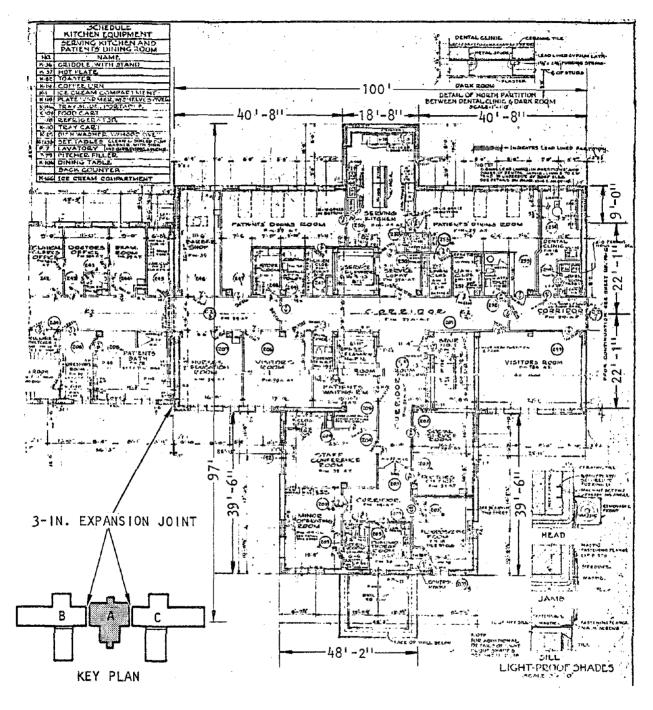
BUILDING 10: SECOND FLOOR PLAN - UNIT A
